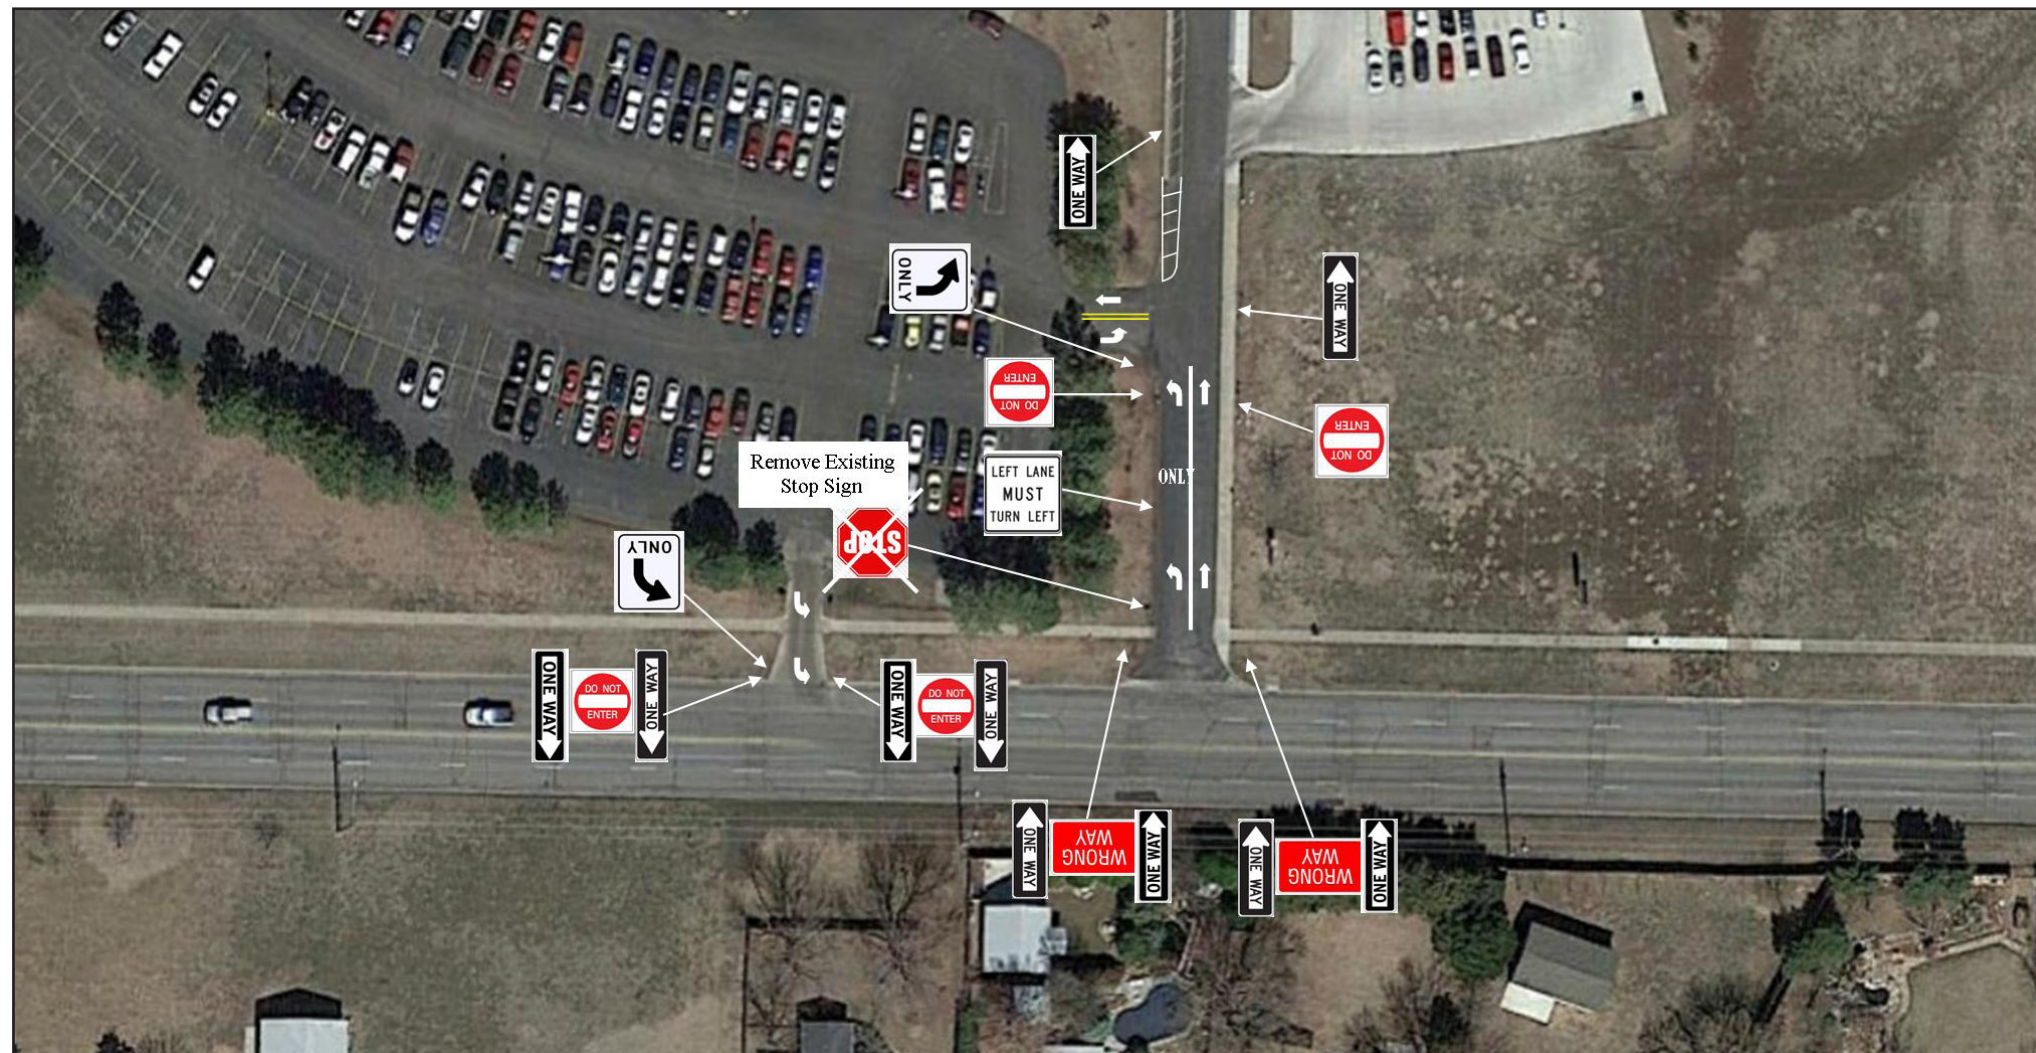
Recommended Improvements in Traffic Signs and Pavement Markings Showing Newton High School Primary Ingress and Egress
